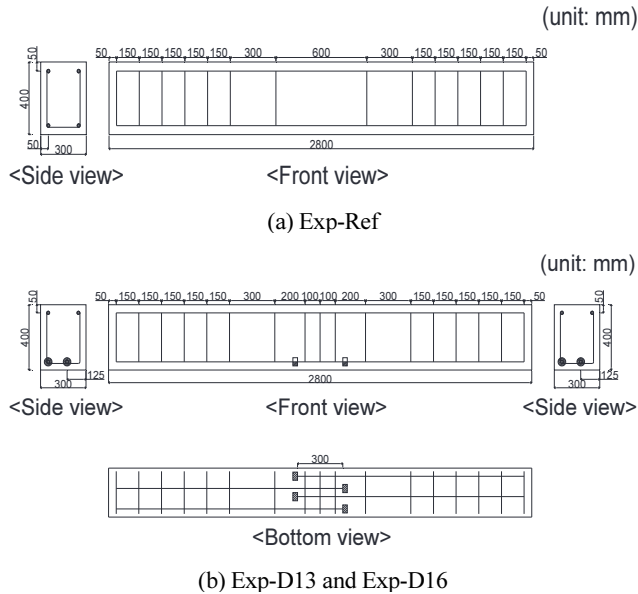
Dimension of specimens (Choi and Park, 2019)
